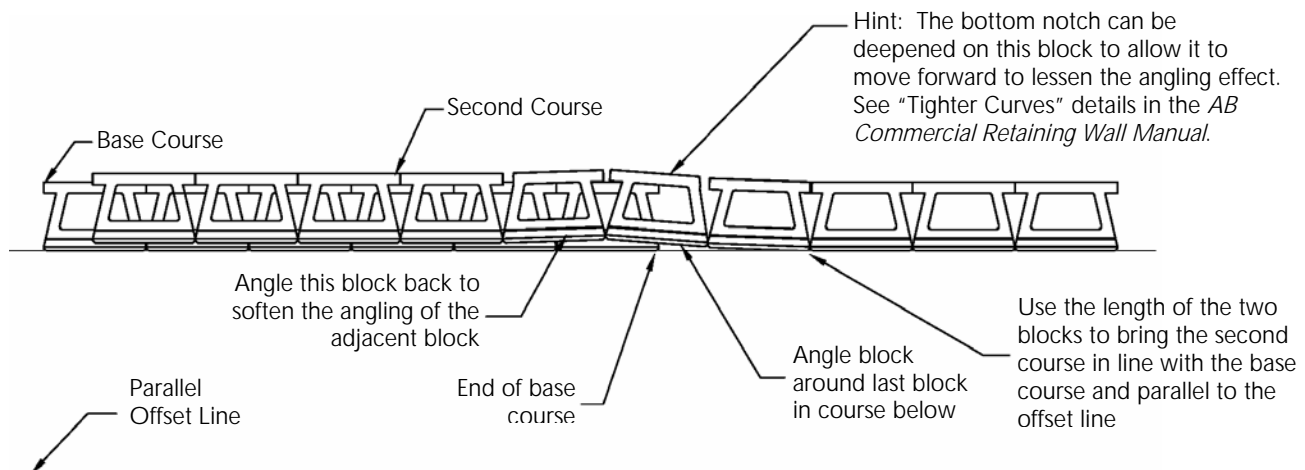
Using a Kink to Build a Straight Wall – Building the Second Course
